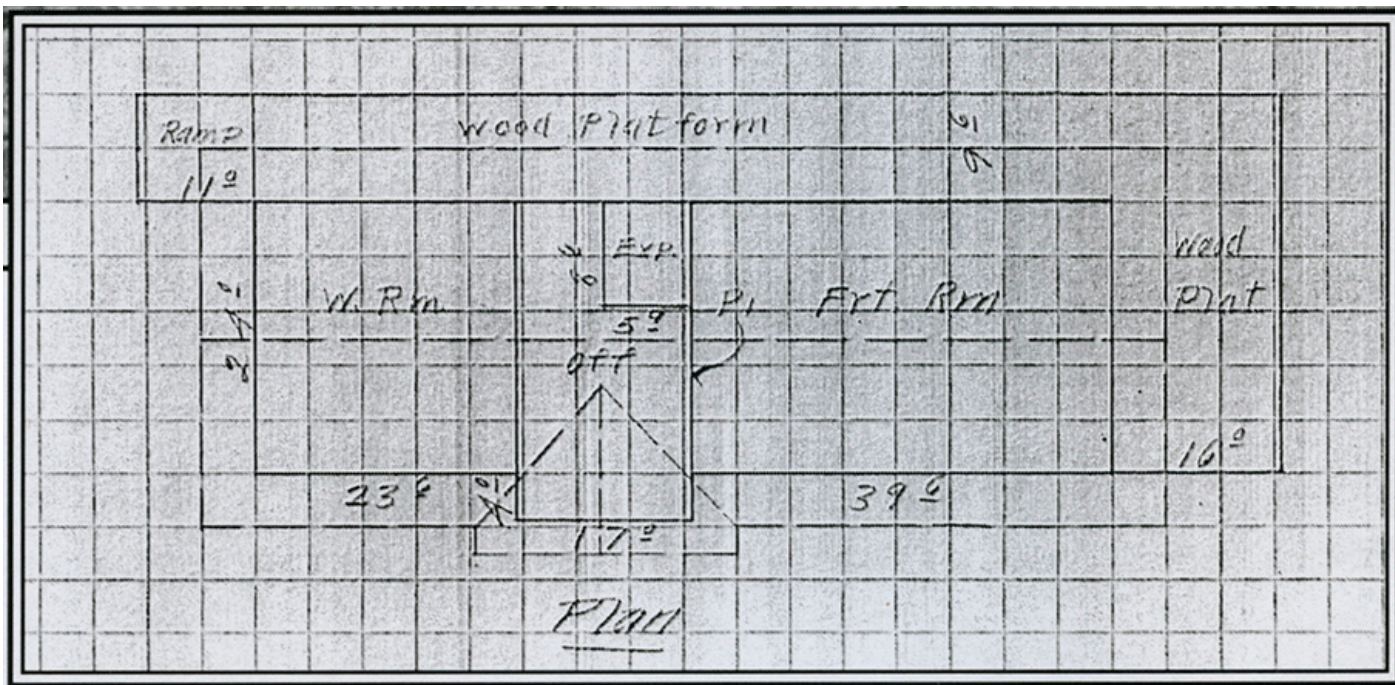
Depot floor plan as documented in 1920 I.C.C. Bureau of Valuation Structural Notes. Drawing includes the wood platforms on the west and south sides of the depot. (National Archives/Corona Telegraph, Vol. 10, No. 2)
